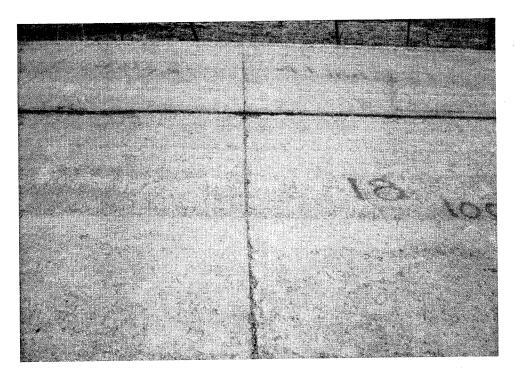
Transverse joint crossing both lanes, Lane 1 in foreground
